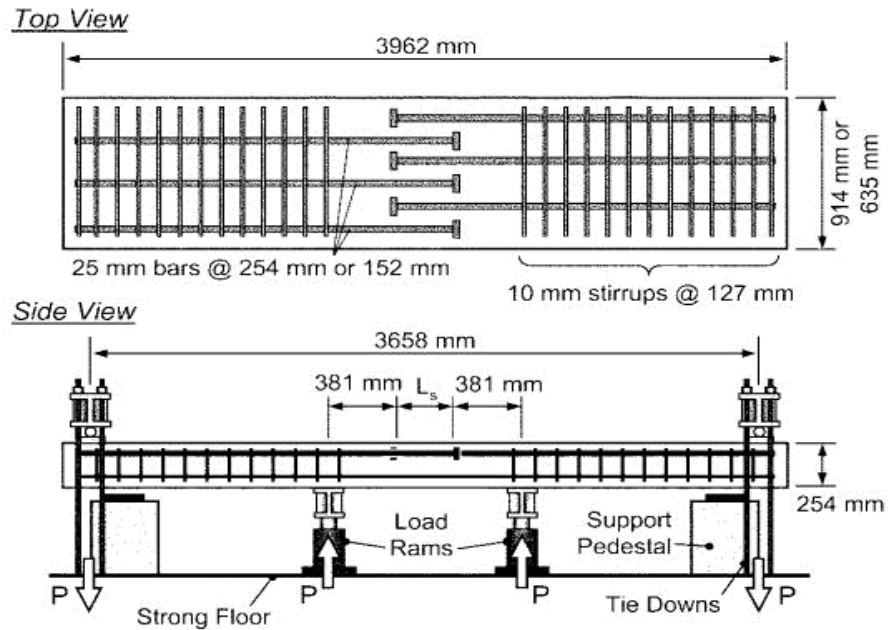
Typical lap-splice specimen used by Thompson et al., 2006.<sup>(40)</sup>
